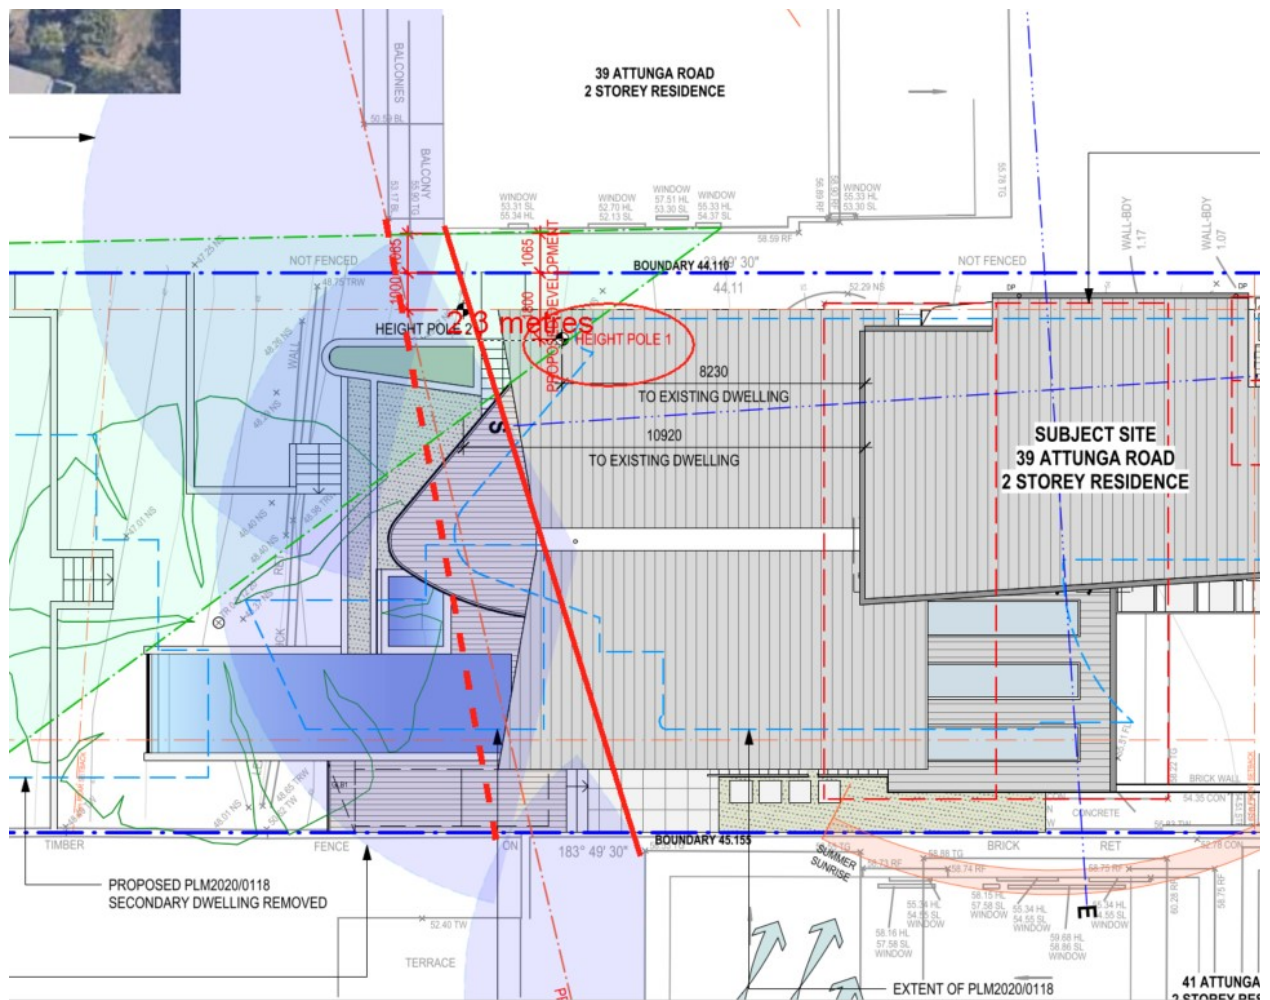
Southern building alignment. Hard red line showing the facade alignment established by the two adjoining buildings on 39 and 41 Attunga Road. The south-western corner setback 2.3m behind this alignment. The dotted red line showing the alignment established by the two adjoining balconies on 39 and 41 Attunga Road.
